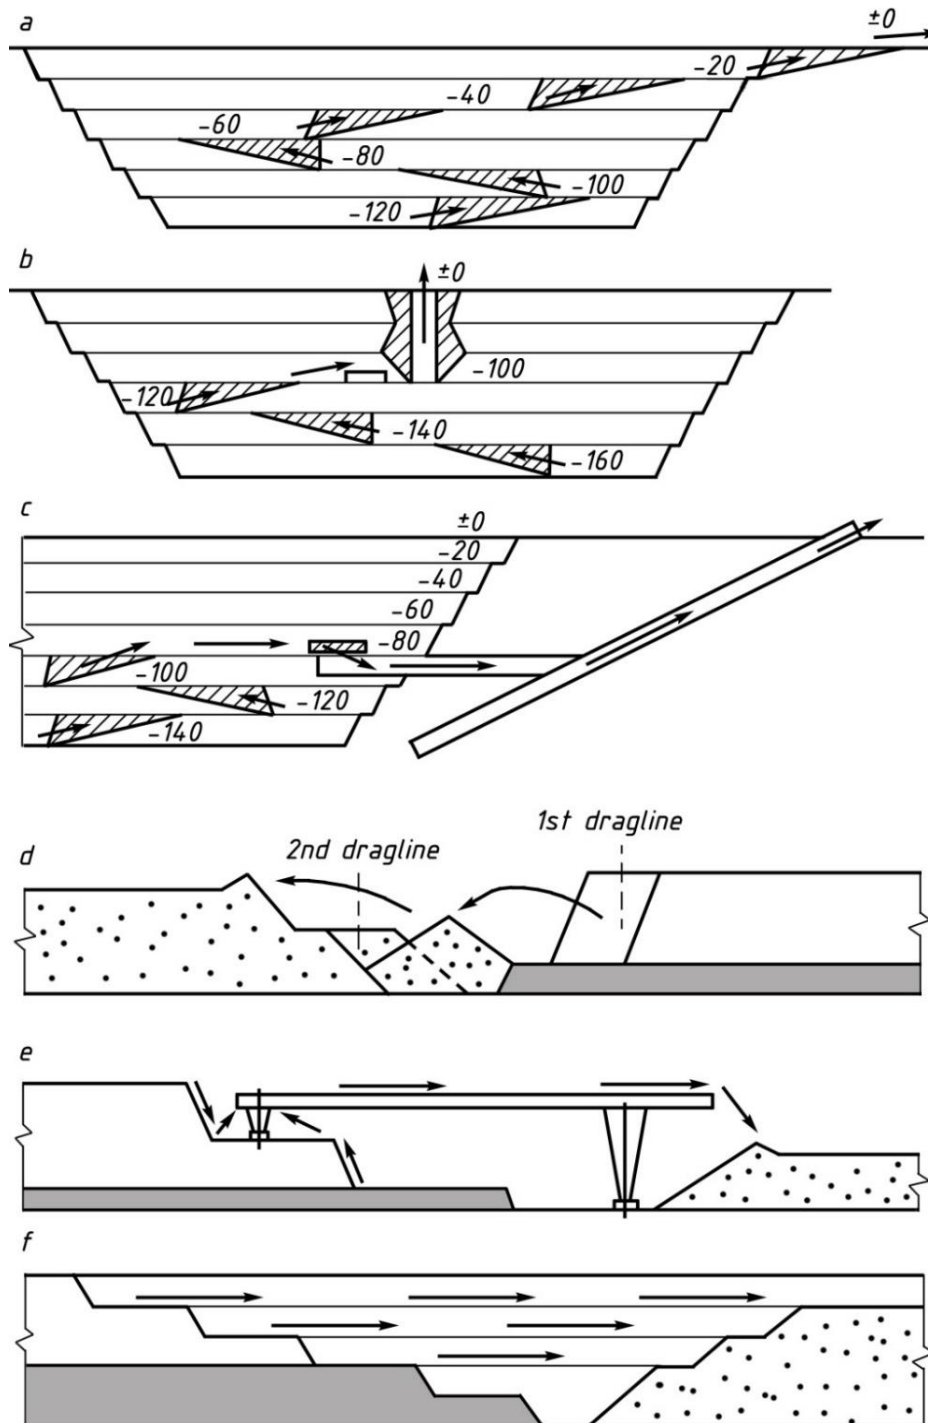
Opening systems of trench (a, b), trench-underground (c) and special (d, e, f) opening methods
